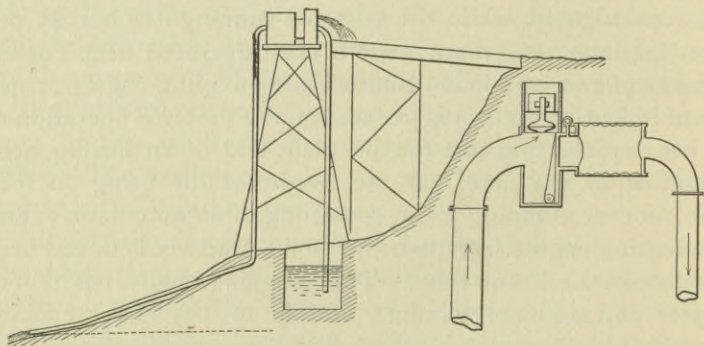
GENERAL VIEW AND DETAIL OF SIPHON ELEVATOR.
